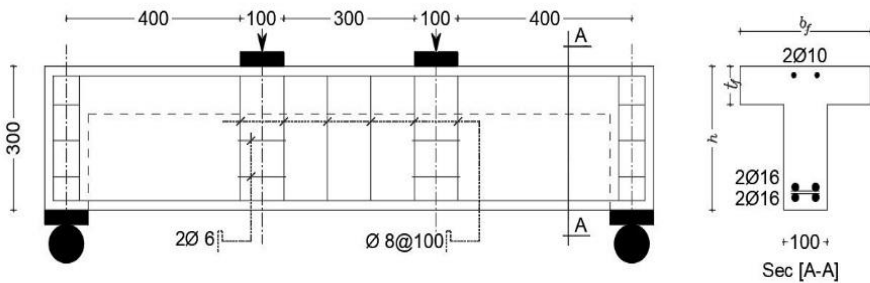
Specimen details and arrangement of reinforcement
